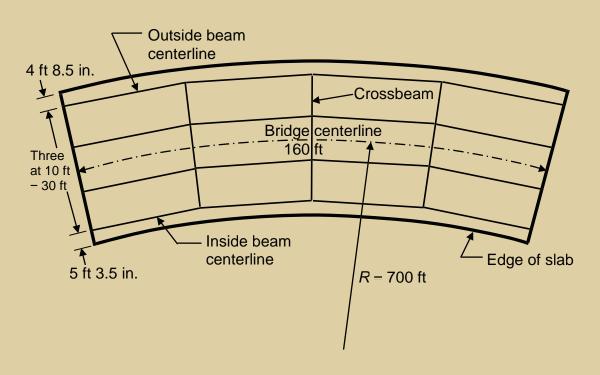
Shown is the plan geometry of the design example. Note: The drawing is not to scale. 1 in. = 25.4 mm; 1 ft = 0.305 m.
